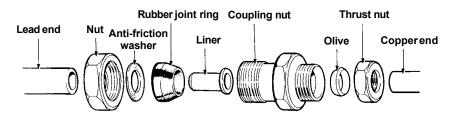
Method of joining a copper or PE pipe to an existing water-weight lead pipe
